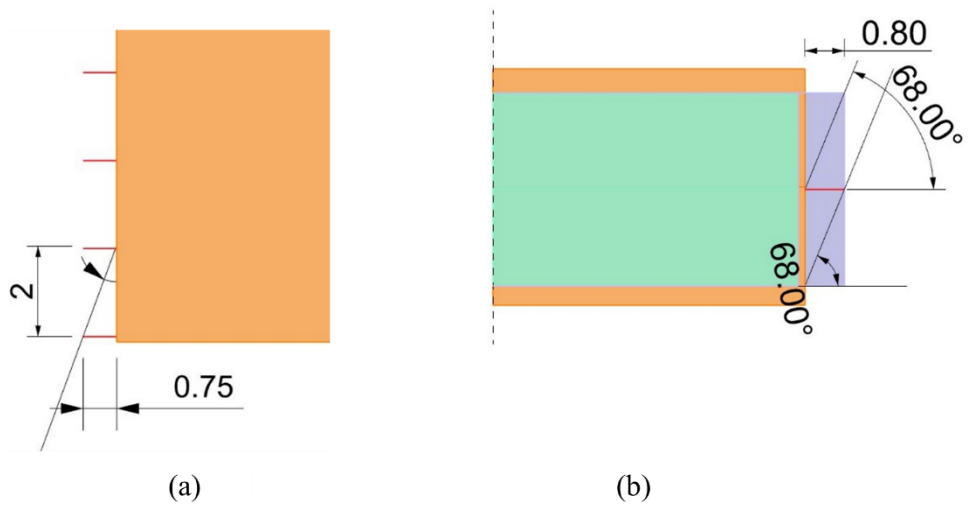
Shading calculations of the first floor for the west facade from the plan view (a) and south facade from the section view (b)
